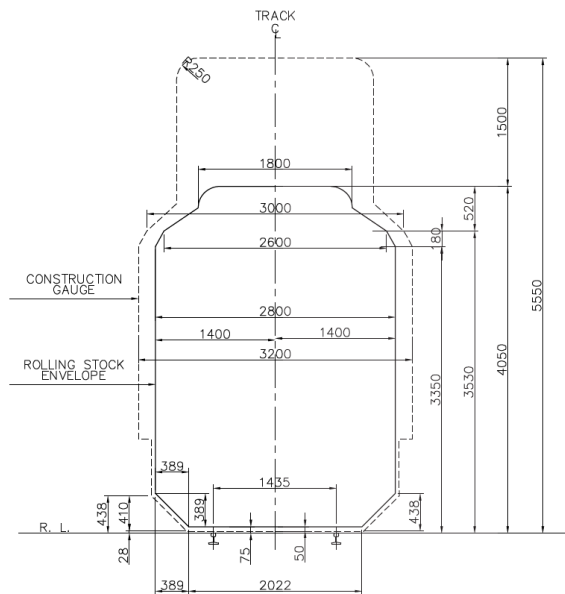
G Rolling Stock Envelope and Construction Gauge
